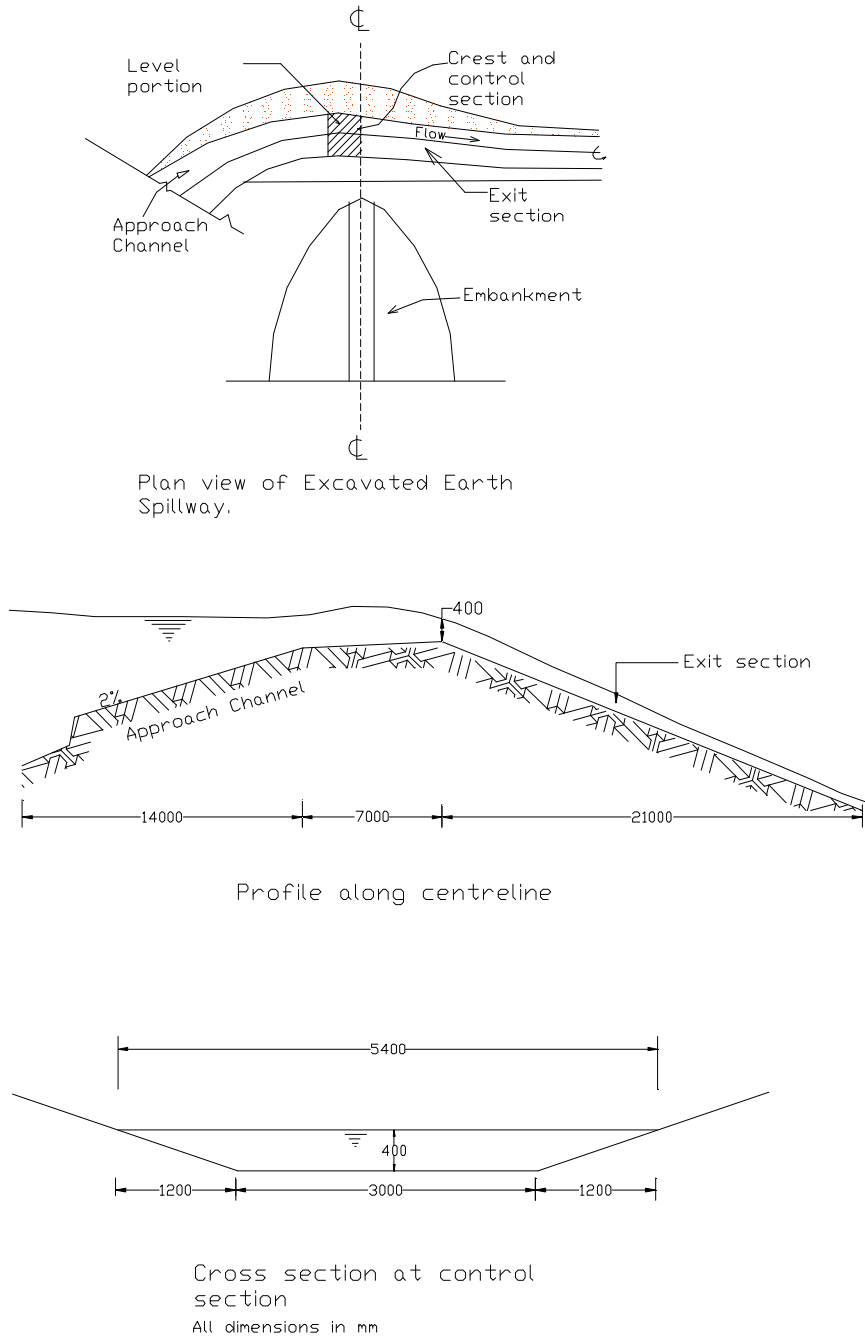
Profile and Cross Section of the Excavated Earth Spillway. (Adapted from Schwab et al., 1993)
